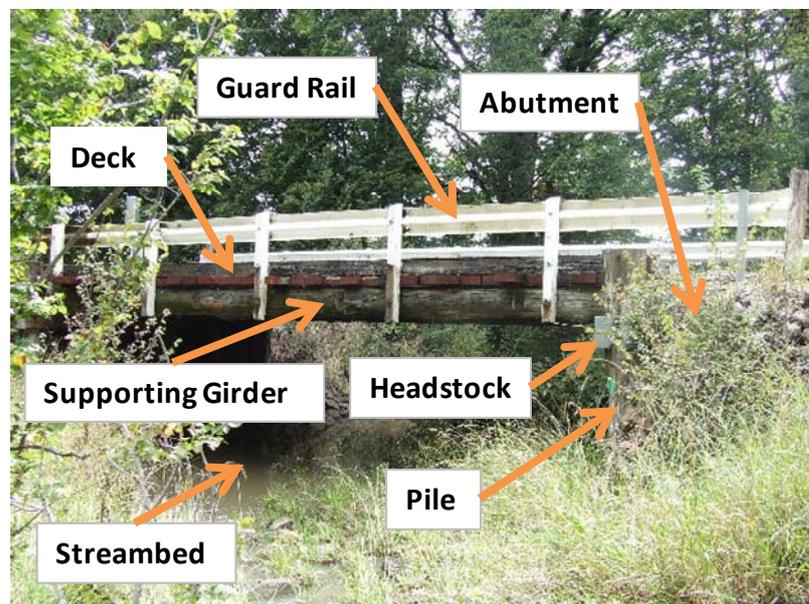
Single span timber-bridge (Powers Creek Bridge, 1930 – 2011)
